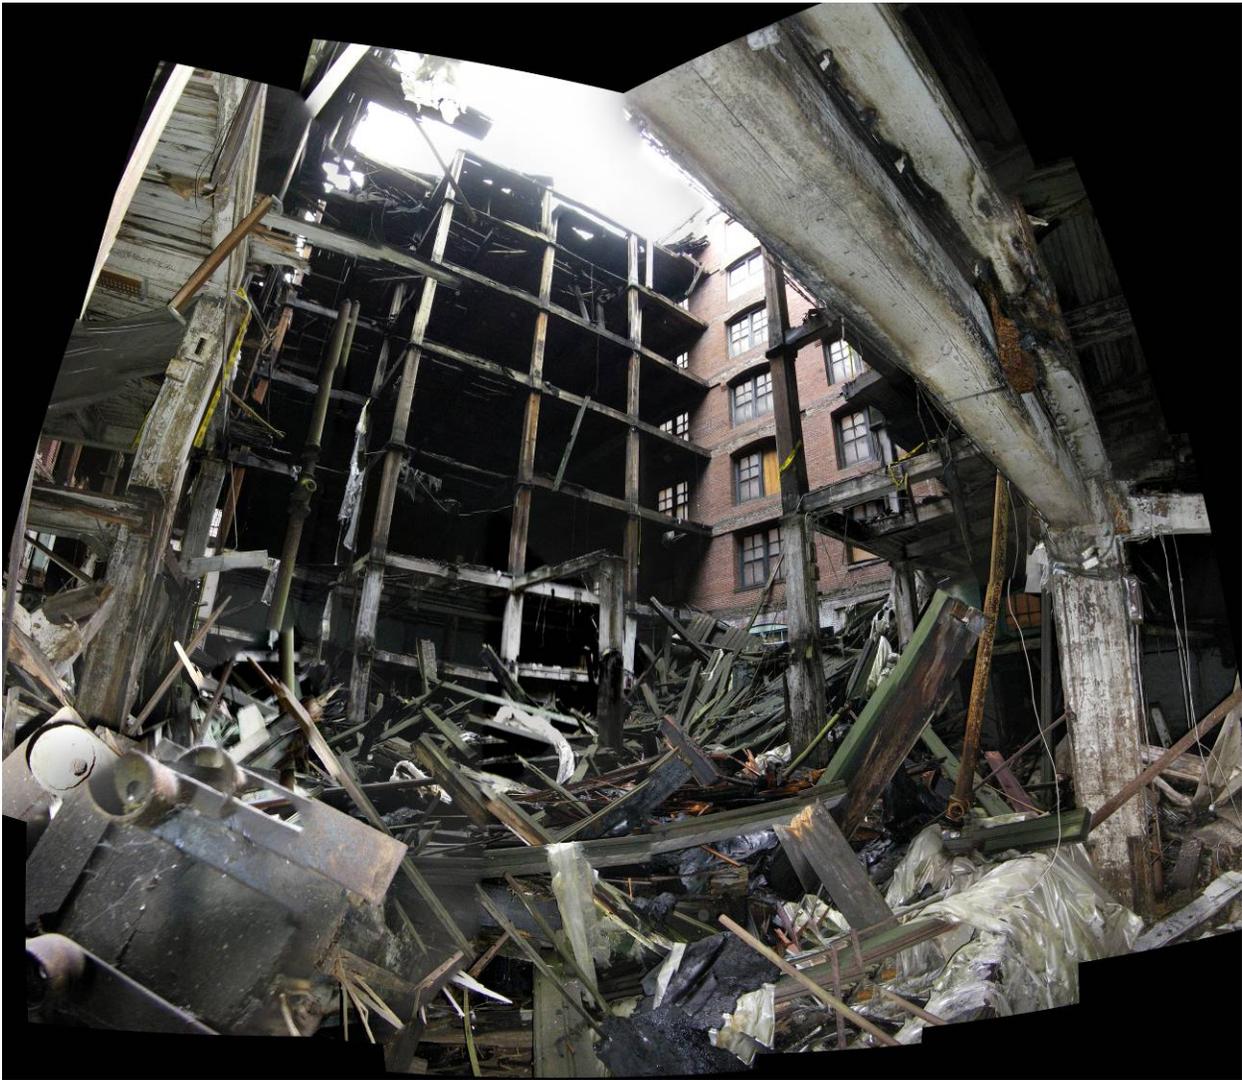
East Side Partial Collapse, Looking Northeast (composite image)
